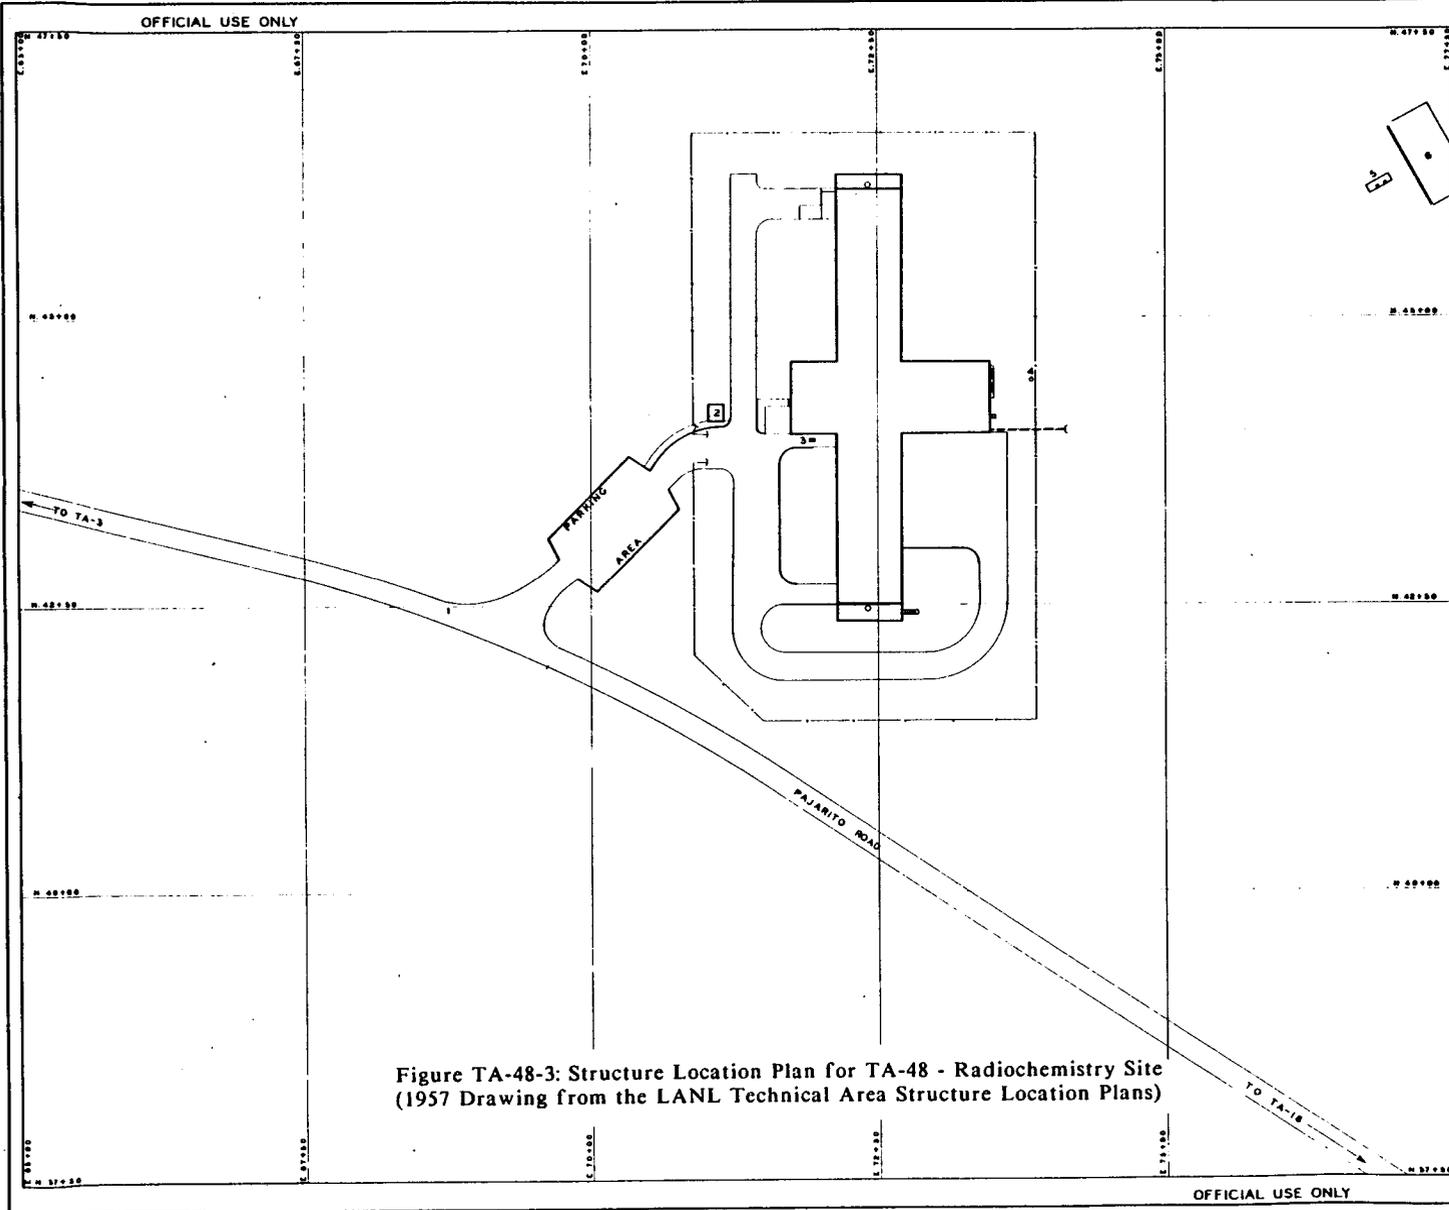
Structure Location Plan for TA-48 - Radiochemistry Site (1957 Drawing from the LANL Technical Area Structure Location Plans)
